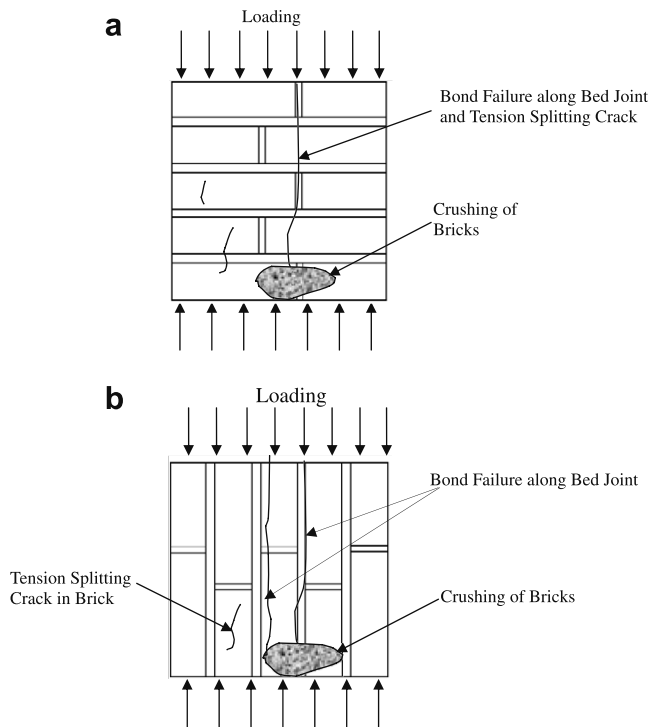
Failure mode of the wallettes under compression: (a) loading normal to bed joints and (b) parallel to bed joints.
